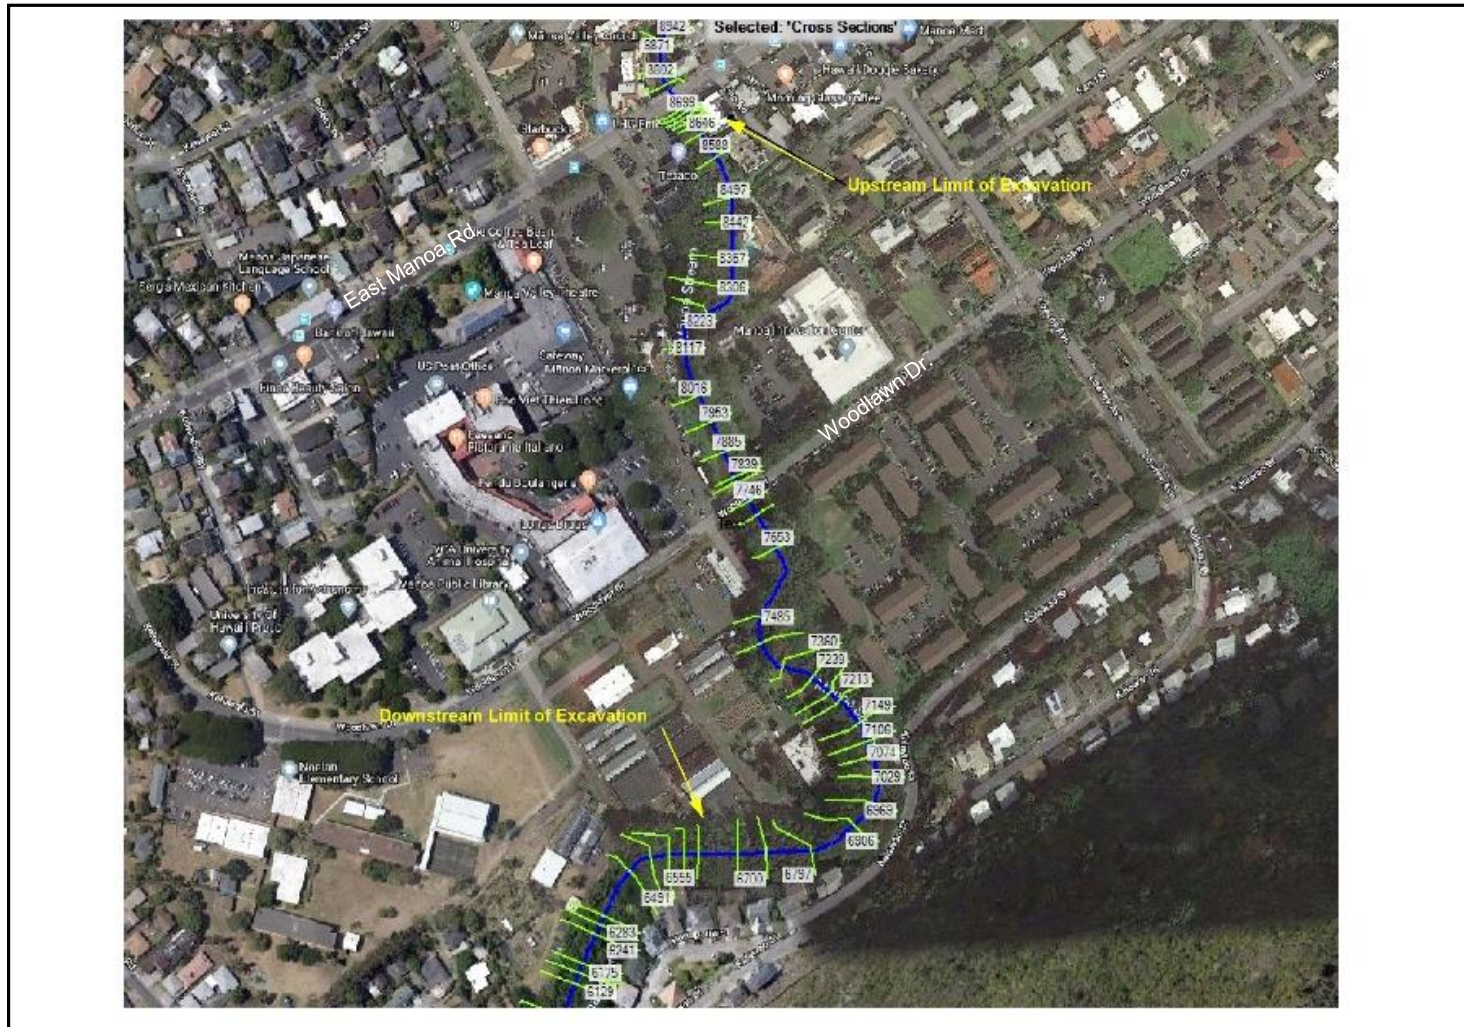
Excavation Area, Manoa Stream-South of East Manoa Road Bridge.
